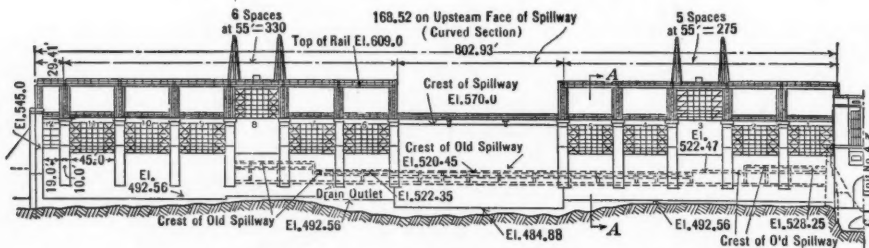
GENERAL PLAN OF NEW CATAWBA STATION.
